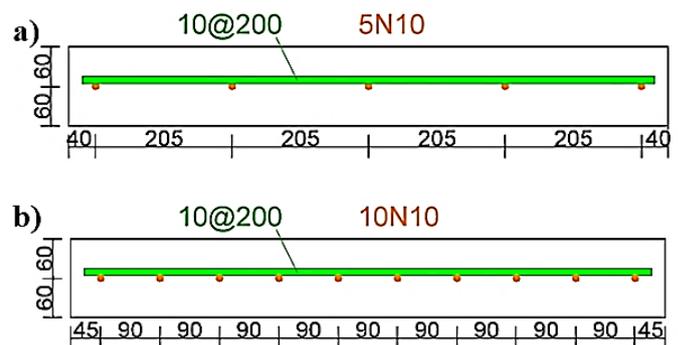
Cross-section and reinforcement layout of specimens (a) Wall1 and (b) Wall2 (dimensions in millimetres)
